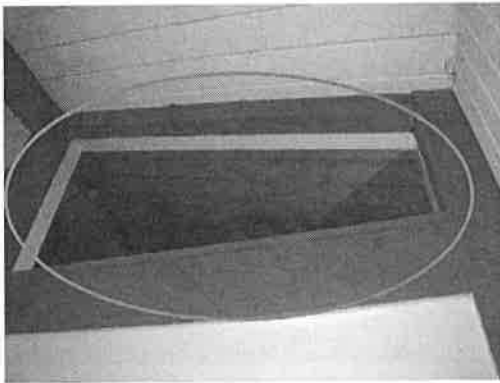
Typical Field Glazed Single Pane Rake Window
